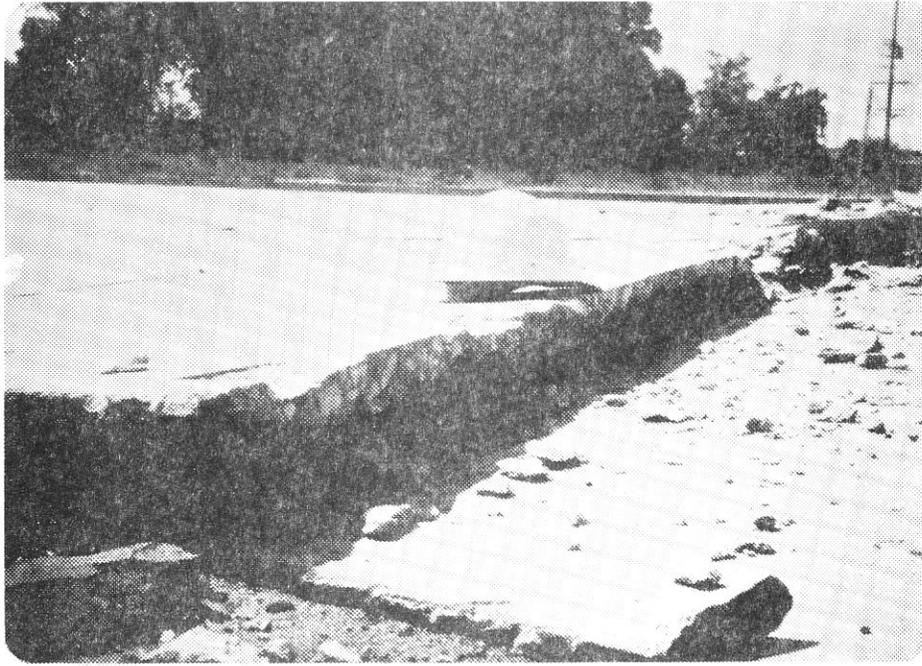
Slab compression and overthrusting in same general area as Photo 137.
